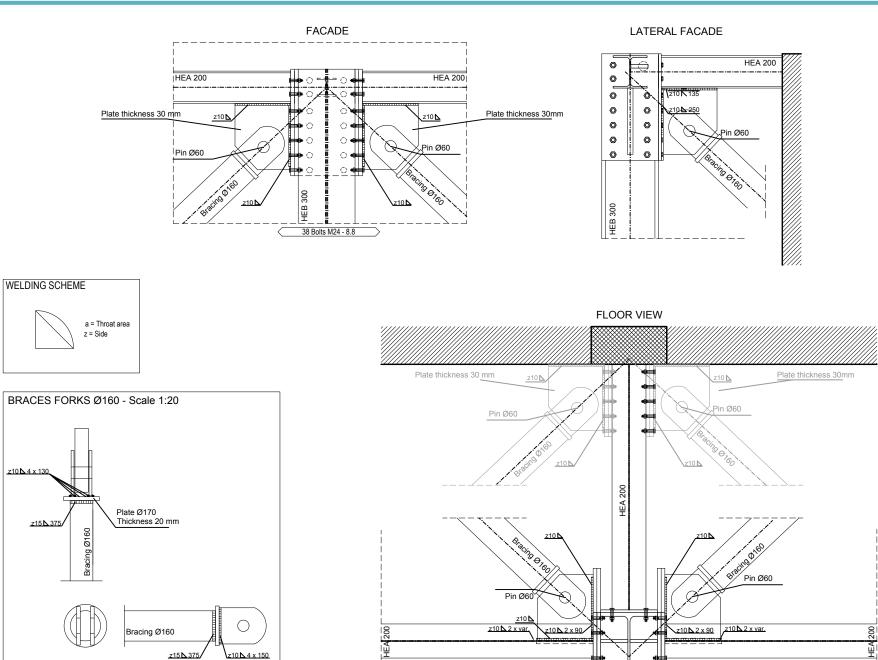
East and West Facade Construction Details Navigator Typology of connections | Scale 1:200
